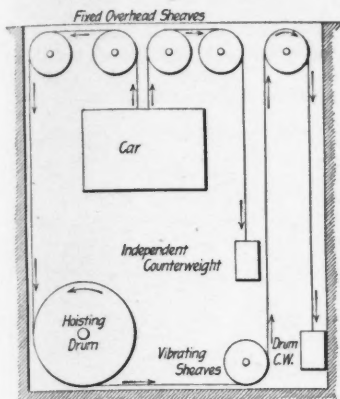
Diagram Section of Shaft, Showing Arrangement of Car Cables and Counterweights.
